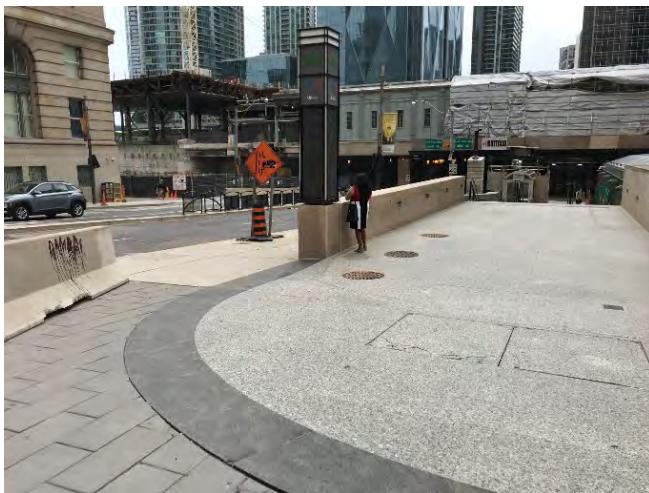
View of the southwest corner of Bay Street and Front Street West facing south. Note the concrete partition between the Union Station open space and the concrete sidewalk closer to Bay Street.
